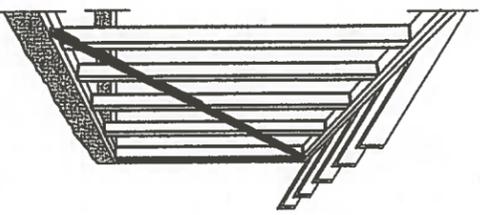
B-TYPICAL TWB (T-TYPE) EXTERIOR WALL BRACE INSTALLATION (MAXIMUM 3/8-INCH DEEP SAW KEYS IN STUDS)
